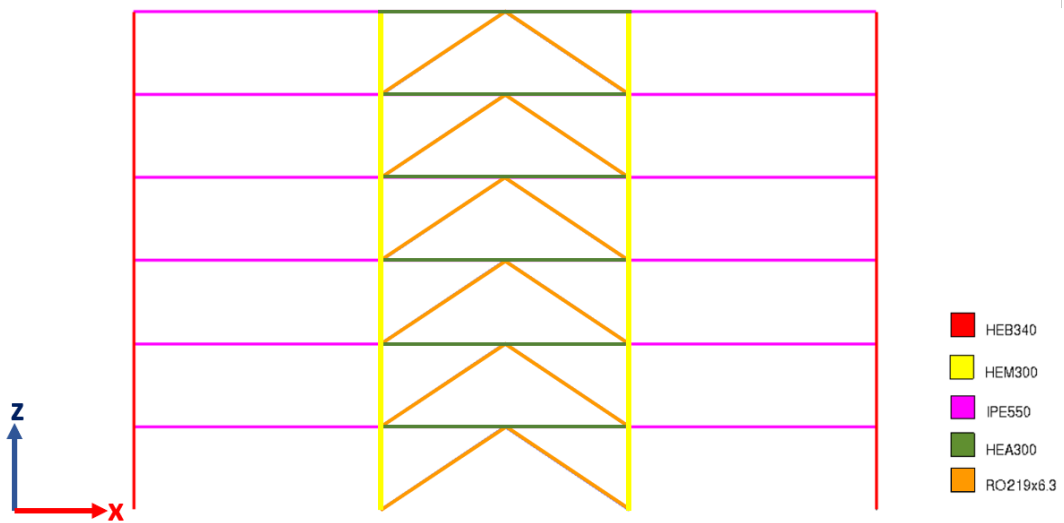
Cross-section of short internal frame elements, with inner core.
